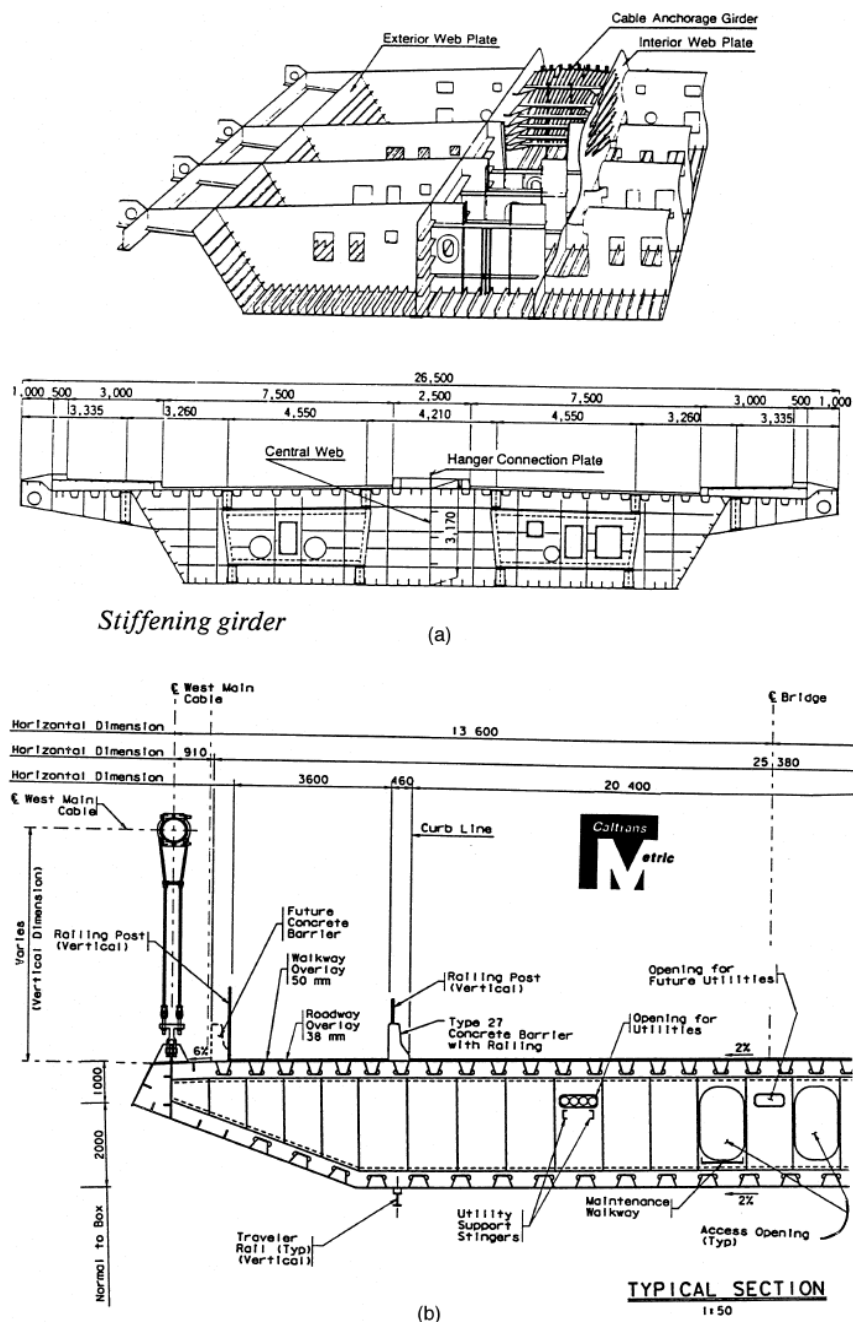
Examples of orthotropic deck box girder bridges (A.R.Mangus, 2000).
